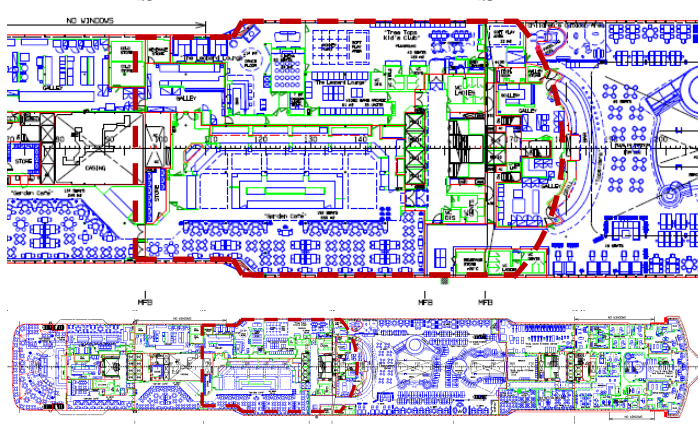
The general deck plan for deck 12 with dining halls and galleys in the aft, the main pool area in the mid section and spa and beauty salons in the fore (Plan: Meyer Werft).
